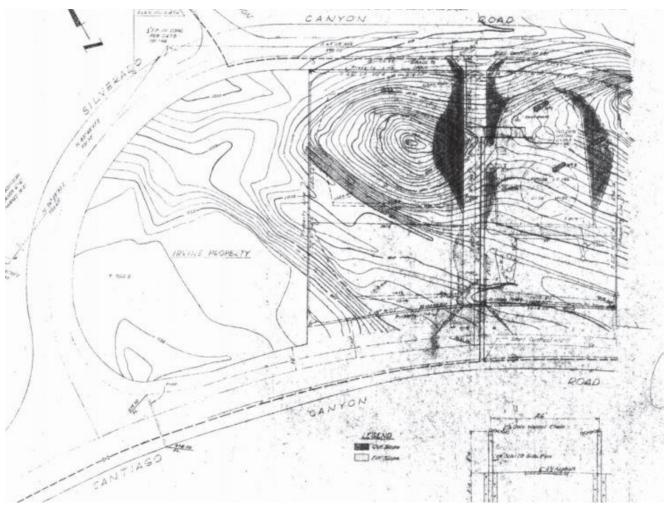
Circa 1964 architectural drawings detail of the Project site. Tank is visible in upper right, large tank to the south was proposed, but was never constructed.
